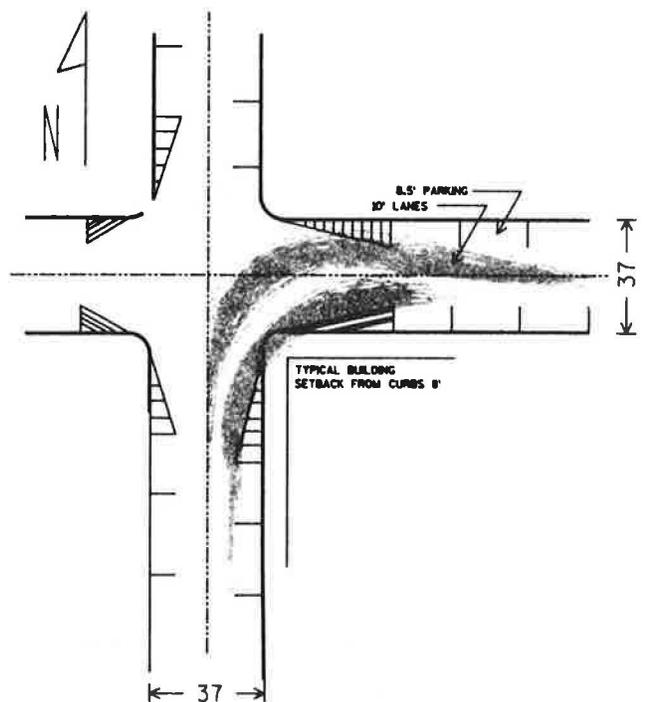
Offtracking/encroachment for 37-ft width approaches: entire approach width used; most trucks will ride over inside curb.
